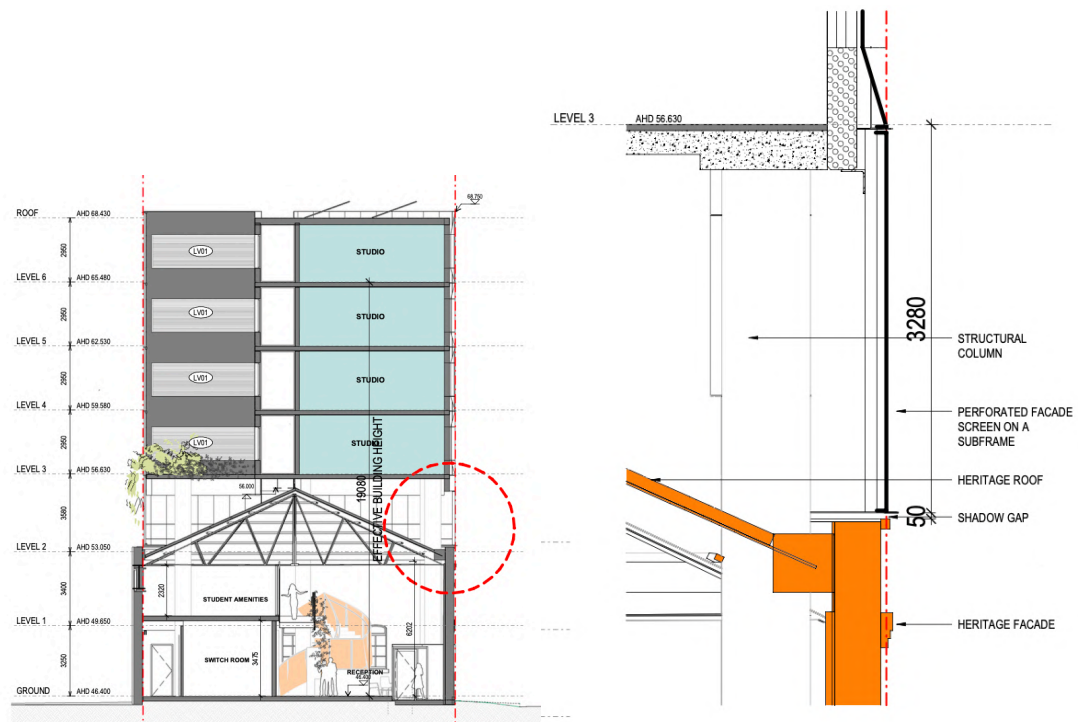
Detail sketch of the interface between the street facade parapet line of the heritage building and screen above.
